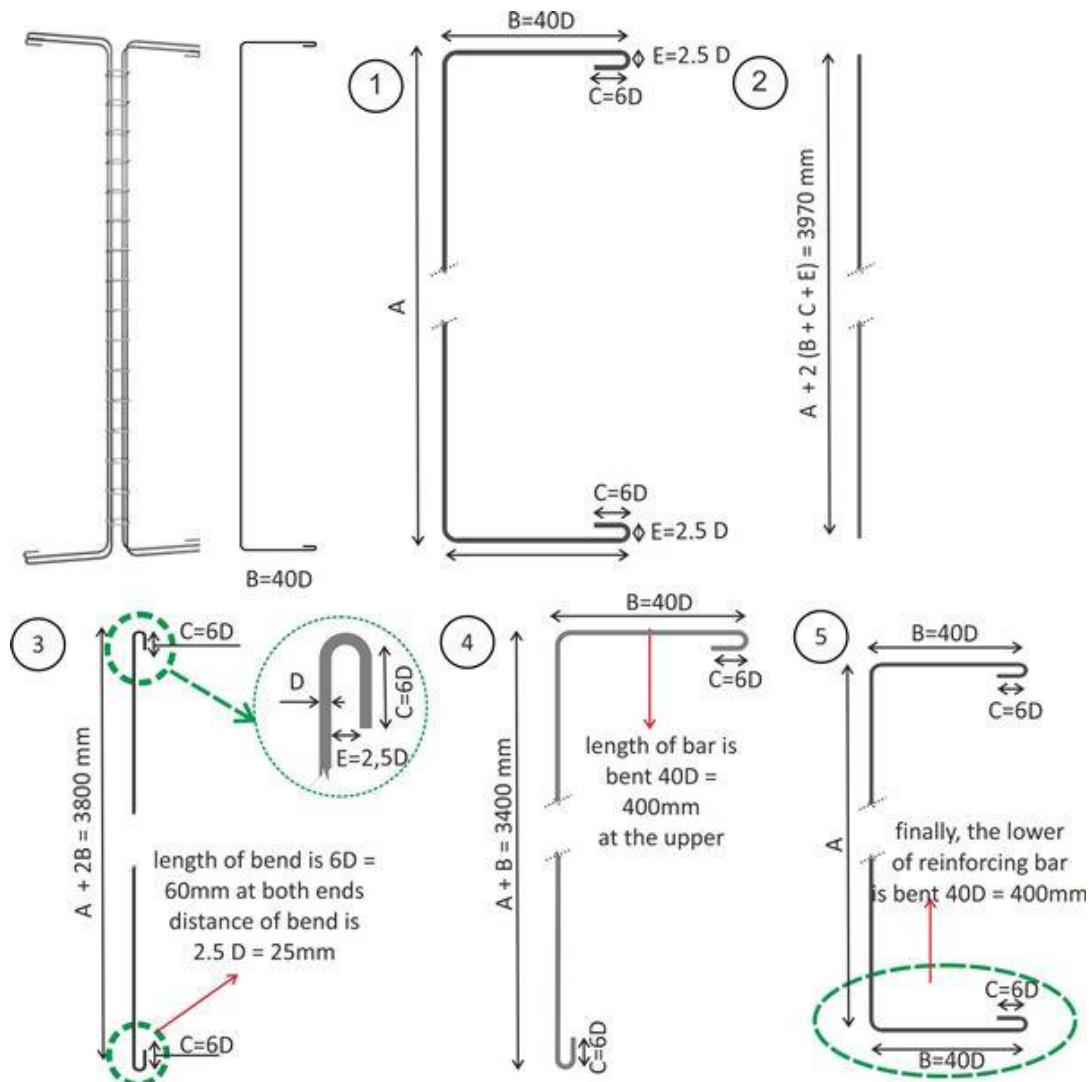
Example Length Calculation of Column Reinforcing Bars
